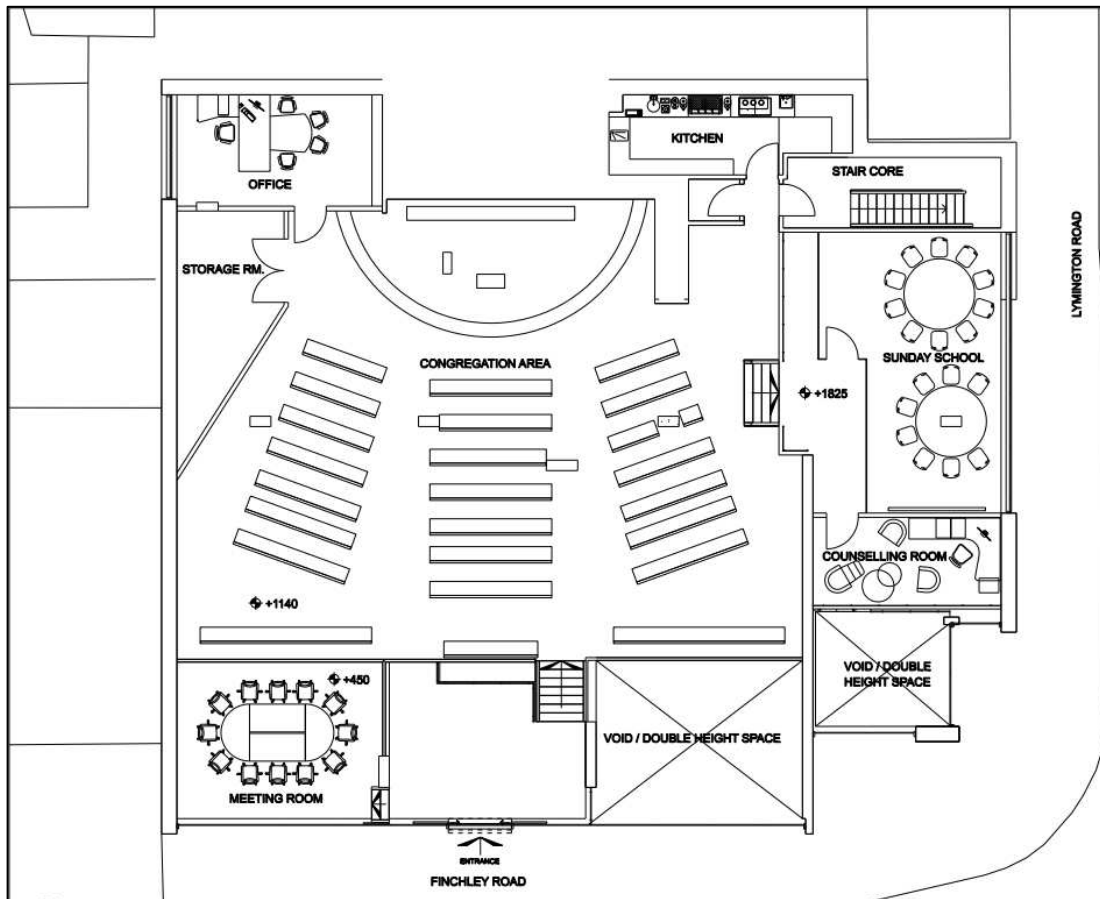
Proposed Floor Plan (Image Source: Powell Skeete Associates Limited)
